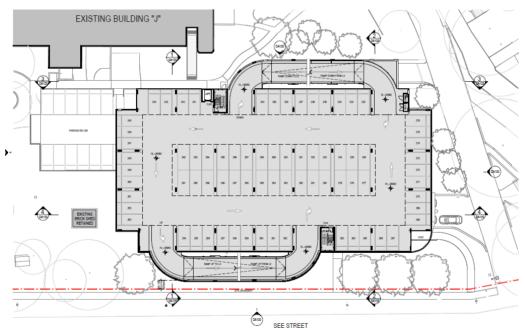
Level 3 Floor Plan (Source: Gray Puksand)
